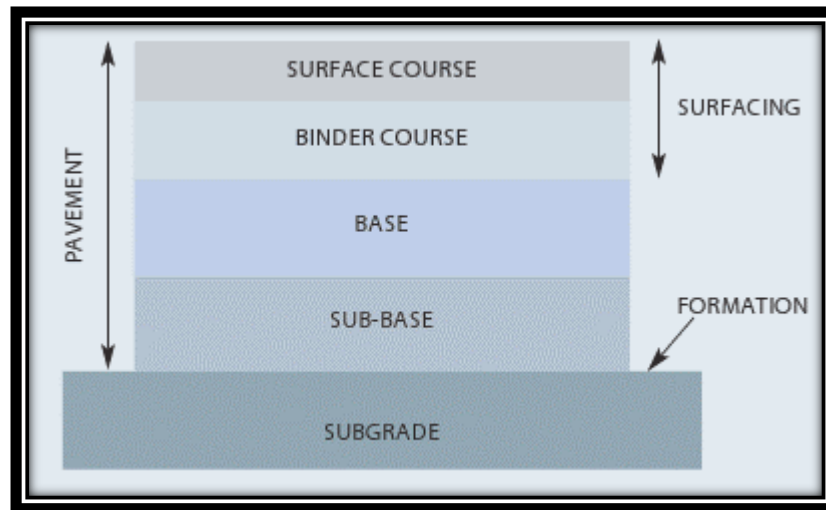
Vertical section of asphalt pavement (www.kattenhornsurfacing.co.uk)
